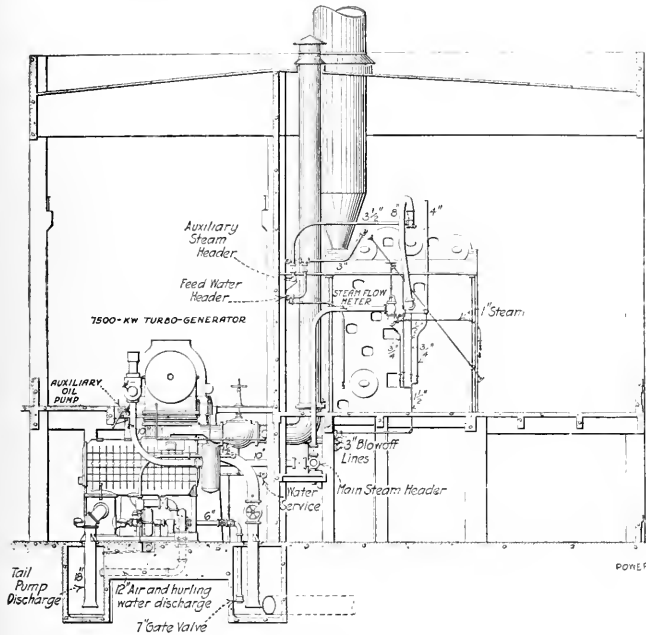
ELEVATION OF THE BOILER ROOM AND BASEMENT
